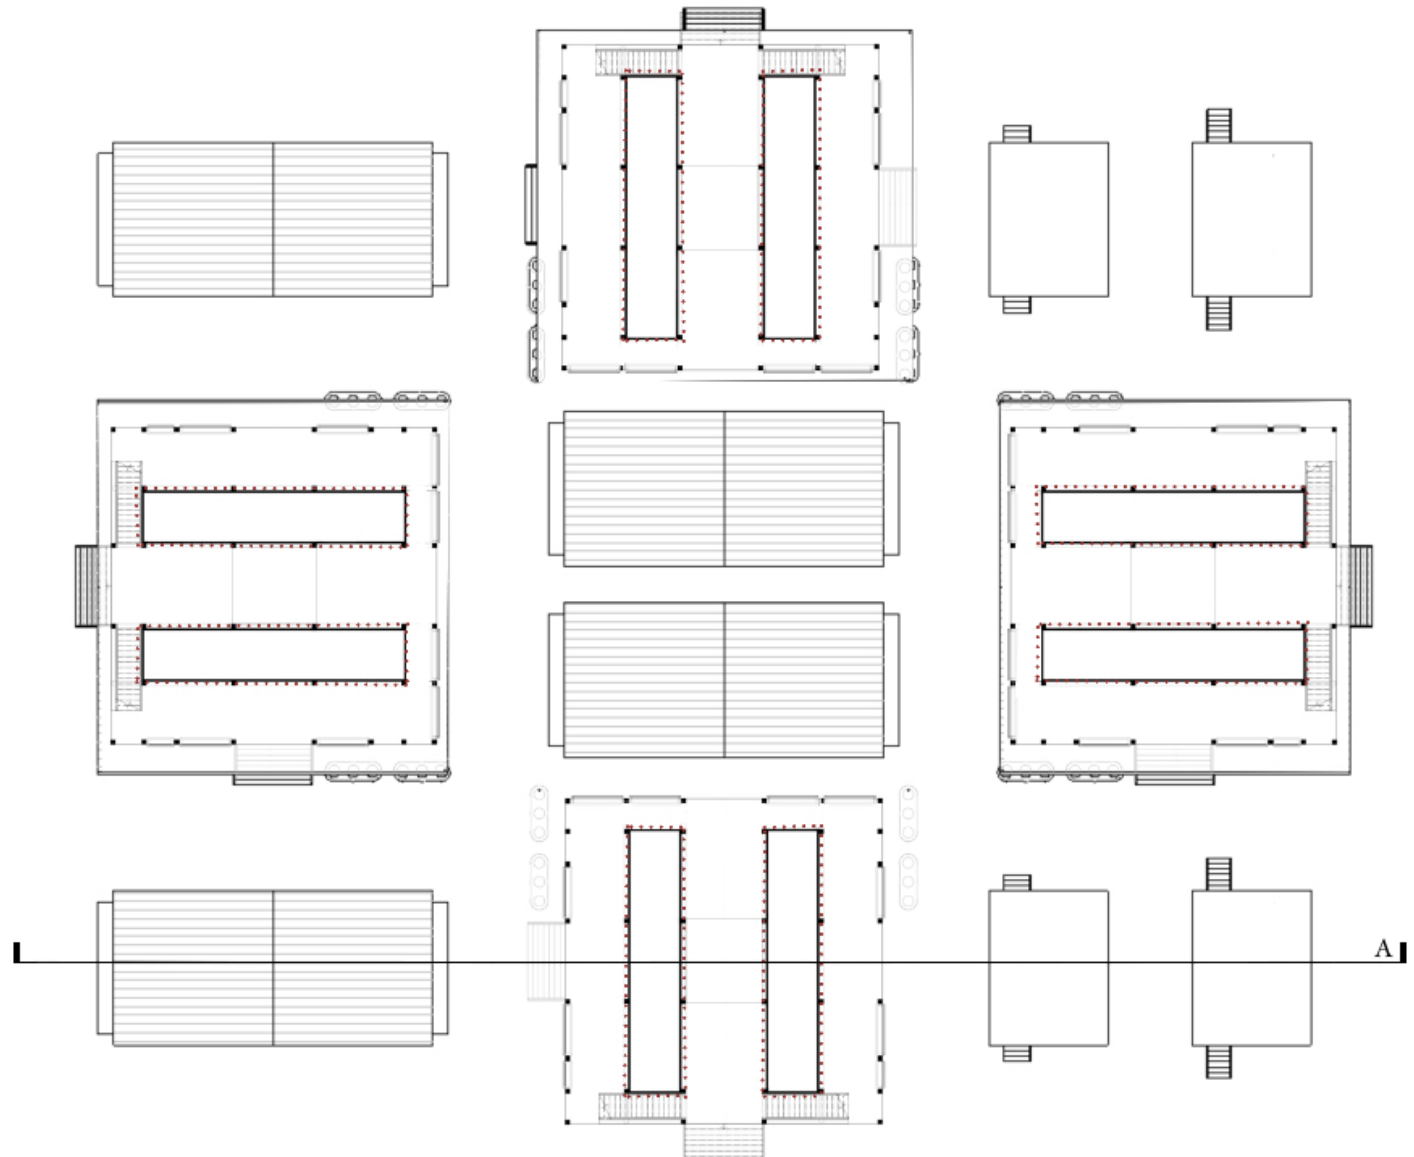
Upper level plan showing top floor layout and shipping container location, authors own work
